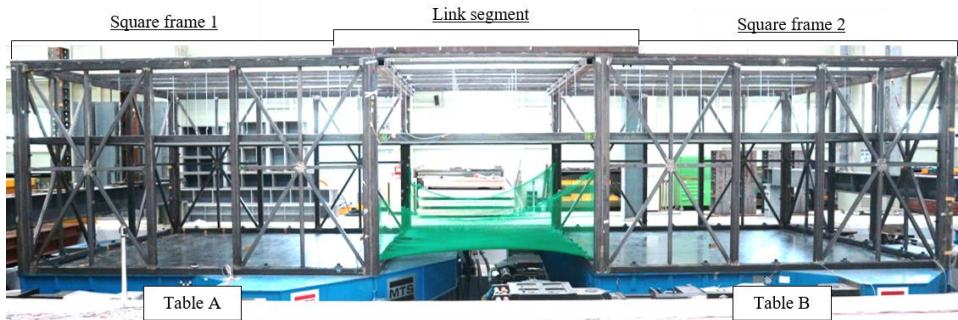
Large-size test frame for shake table testing of suspended ceiling systems and modular segments
